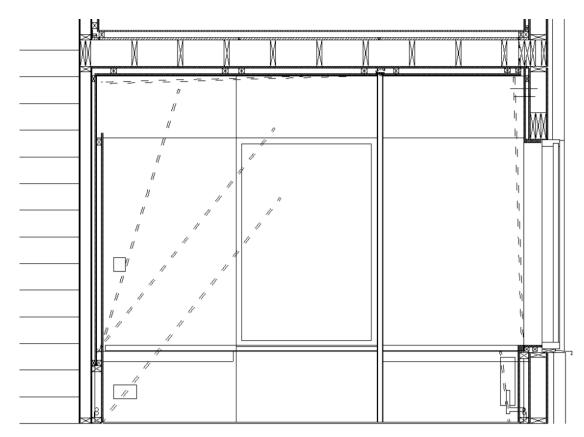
Revised section with hinged wall panels to facilitate service maintenance (Walsh 2021)
